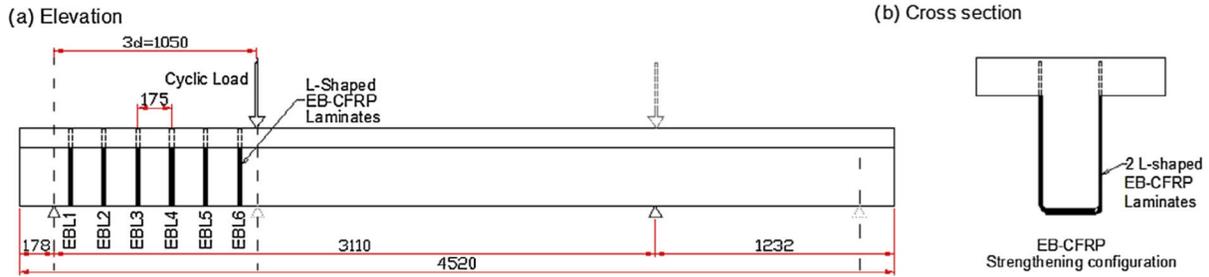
Two L-shaped laminates for shear strengthening of T-shaped girders [98]
